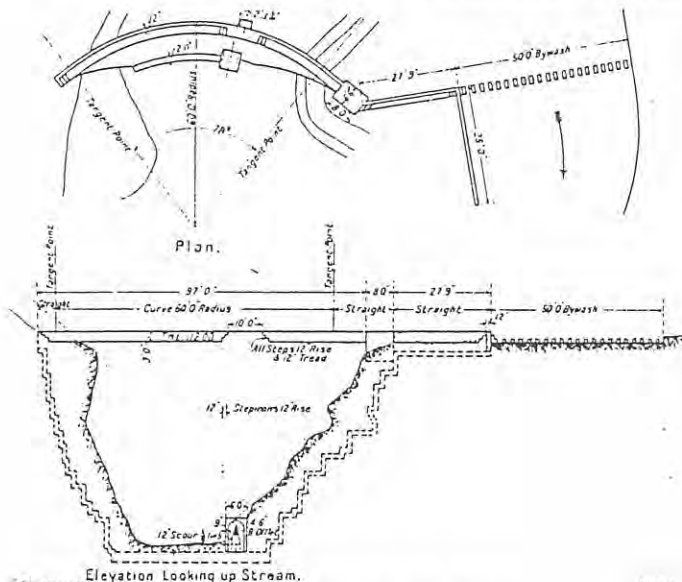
THE MEDLOW DAM—PLAN AND ELEVATION
